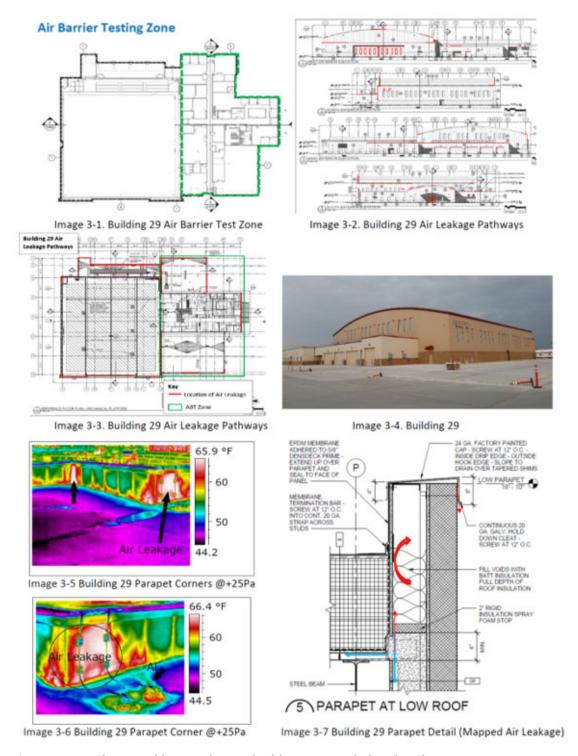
Failures and lessons learned; Bldg. 29, IR and plan details.
